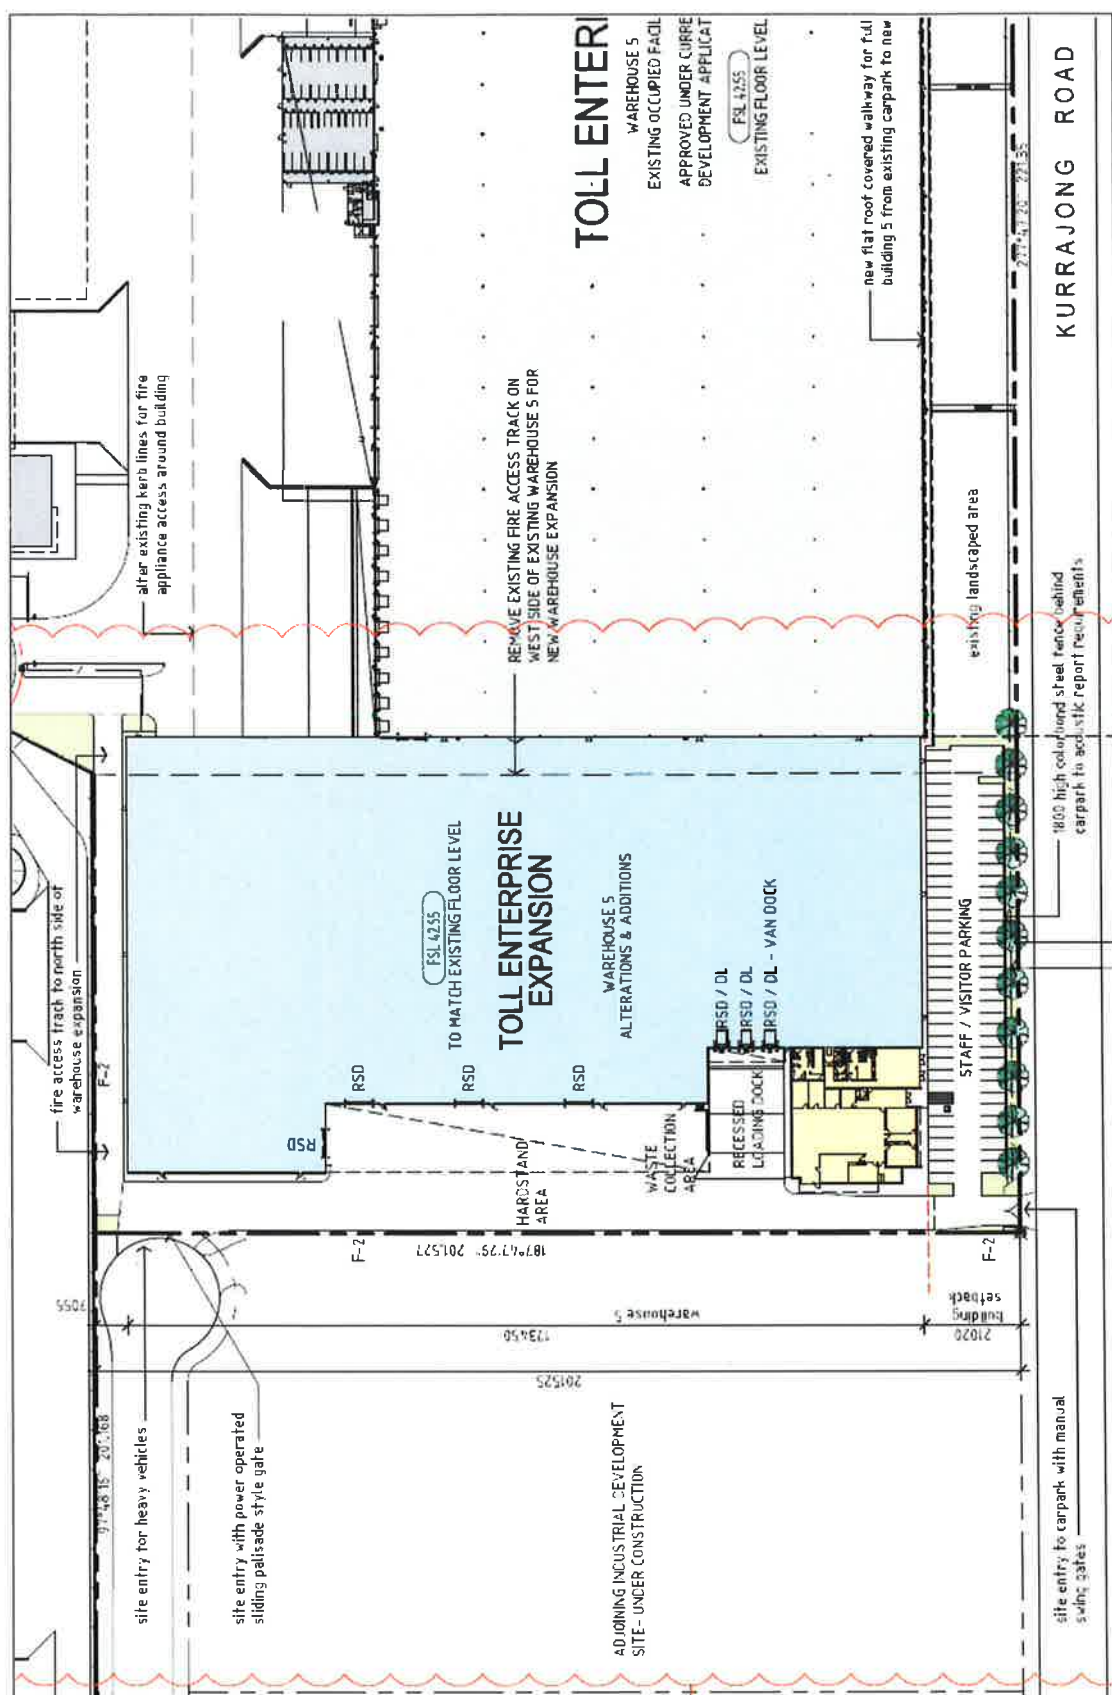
| Proposed Site Plan under SSD 7155 MOD 6
